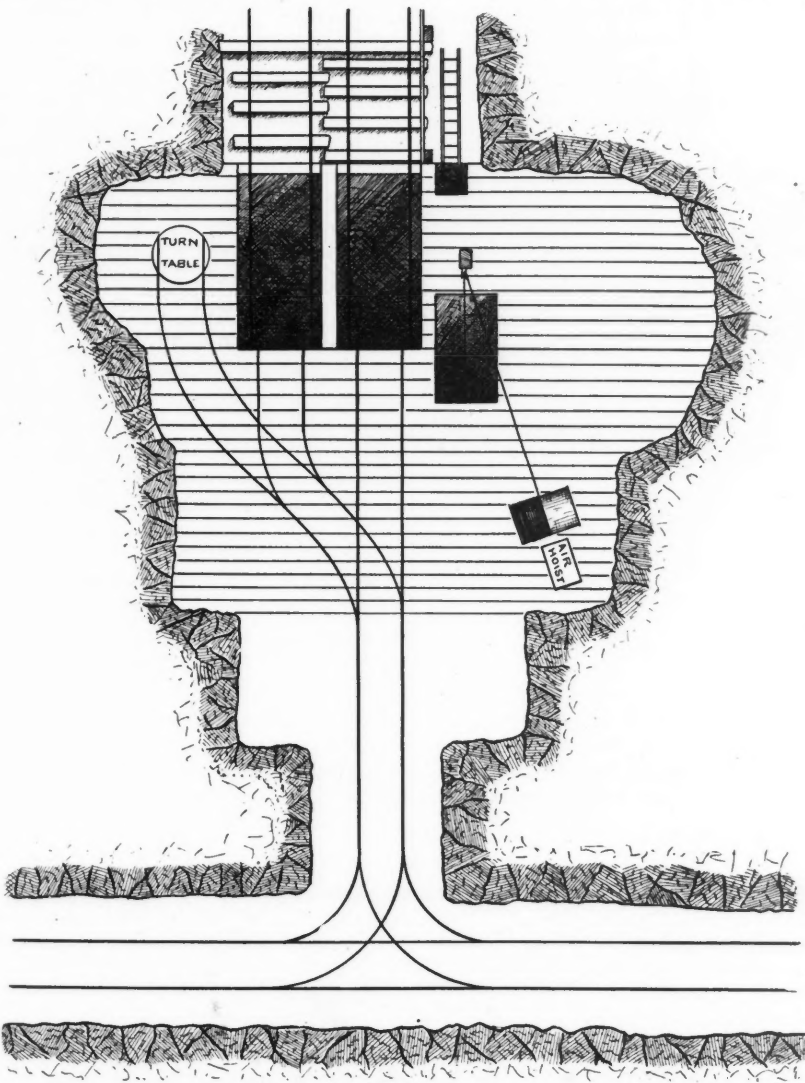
PLAN OF STATION AND ARRANGEMENT OF TRACKS IN CROSSCUT AND LEVEL
